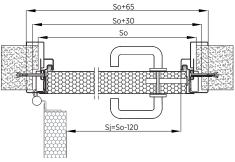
Installation of a single-leaf door to a masonry wall – wrap-around frame with a thermal break – horizontal cross-section
